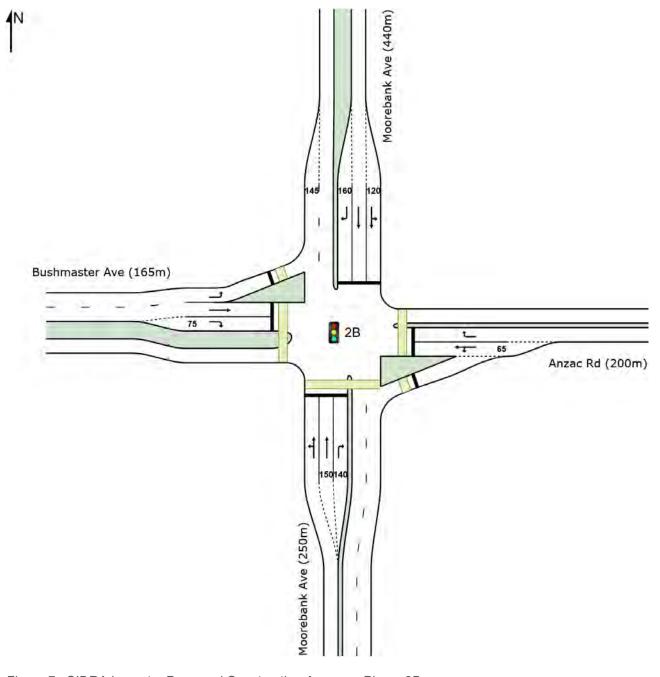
SIDRA Layout – Proposed Construction Access – Phase 2B
